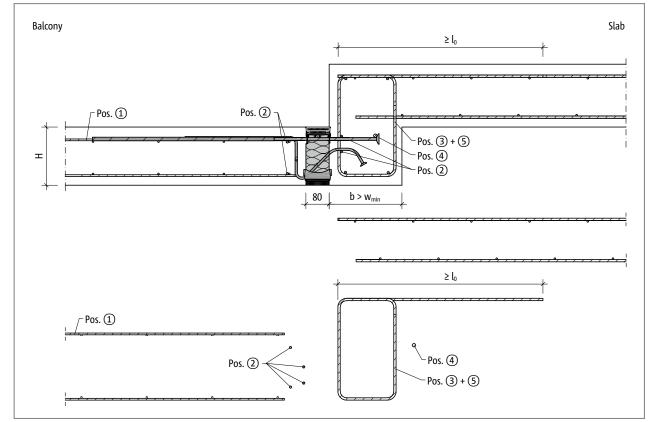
Schöck Isokorb® T type K-U: On-site reinforcement for balcony with height offset downwards with larger structural element dimension (w_{exist} = w_{min})
